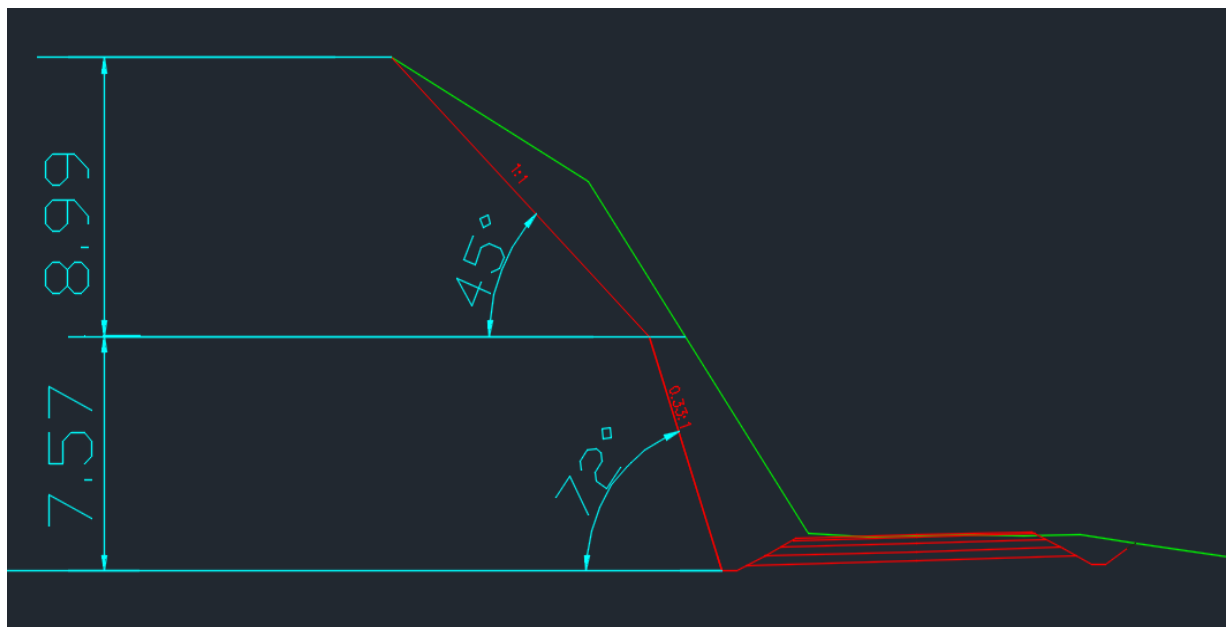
Cross-section of the road at station km 100+300 (Source: Project Consultant)
